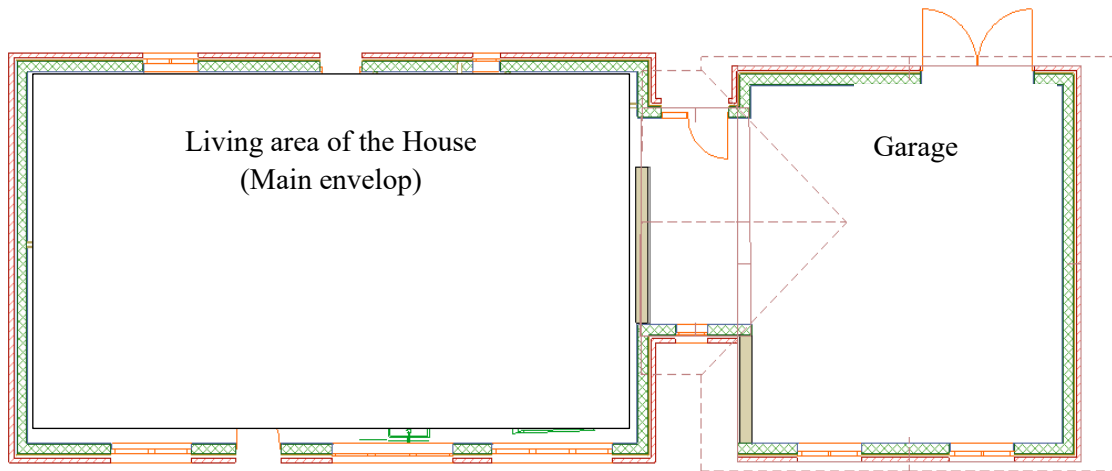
Floor plan of the Passive House in Newfoundland, being used for case study.
